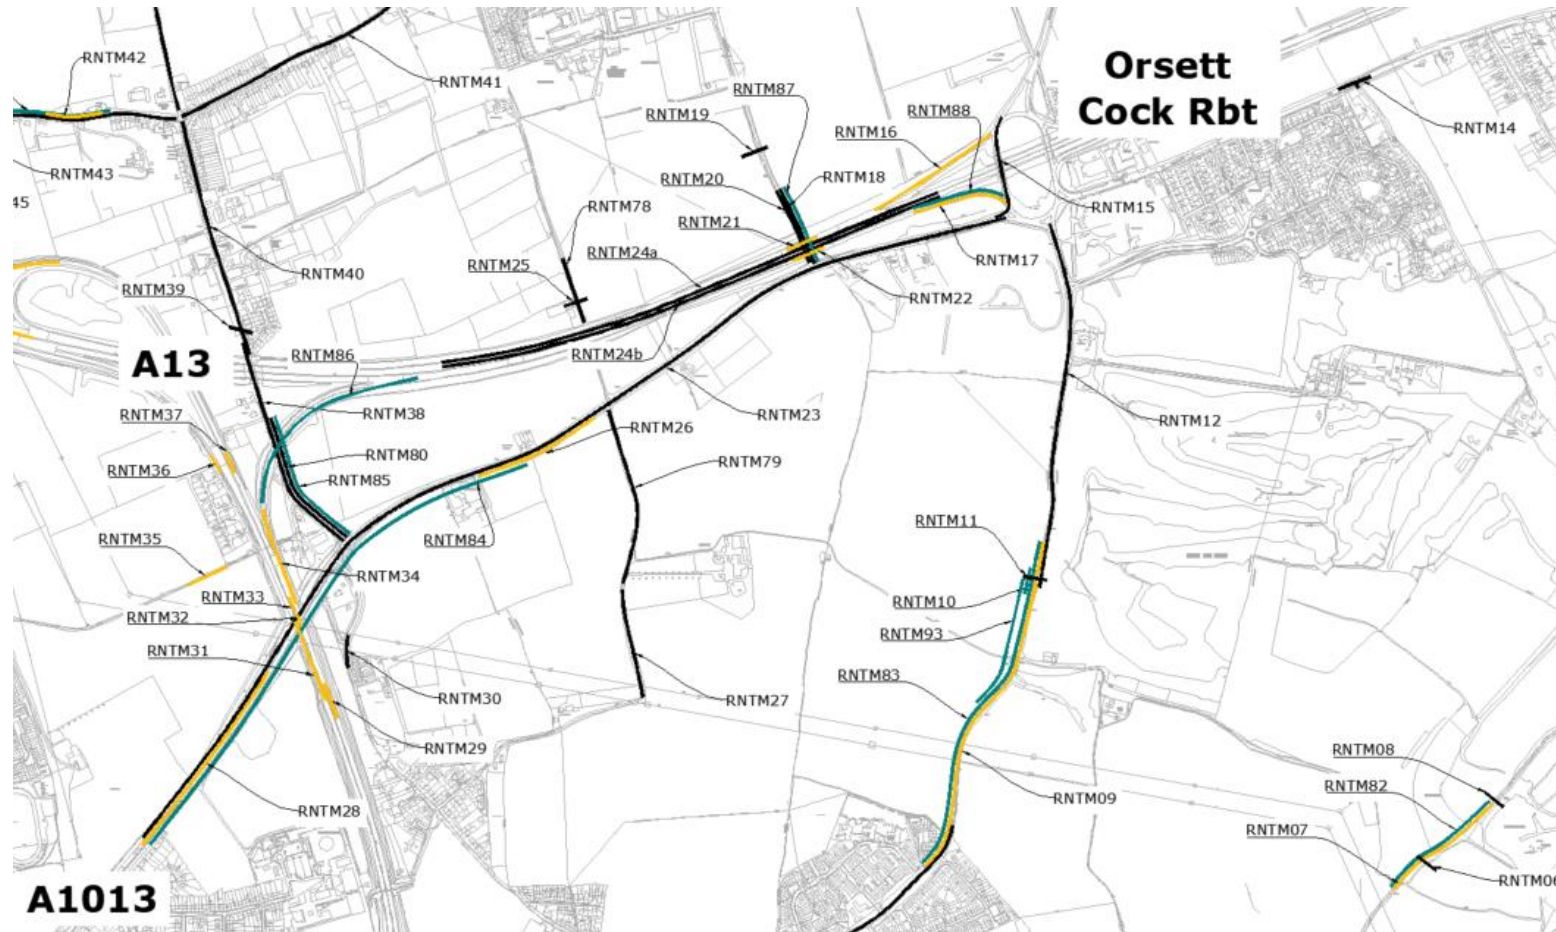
Roads North traffic management measures location plan (3 of 7)
